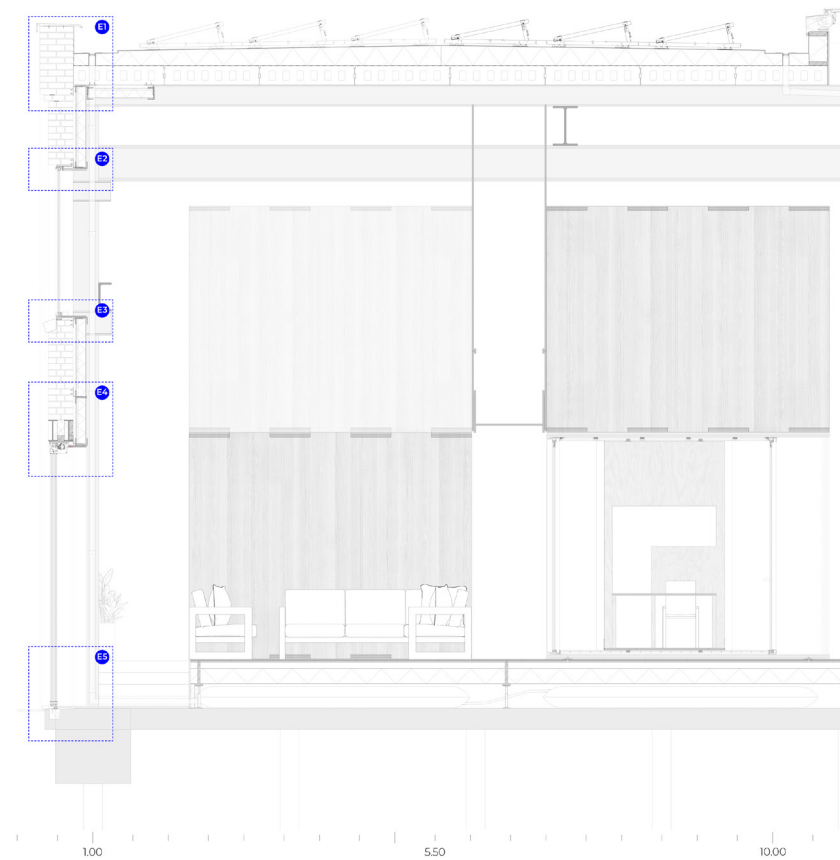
DETAIL DRAWINGS | VERTICAL SECTION D | SCALE 1:10
